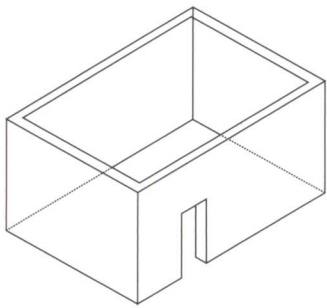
OUTDOOR AREA - EXAMPLE 1
